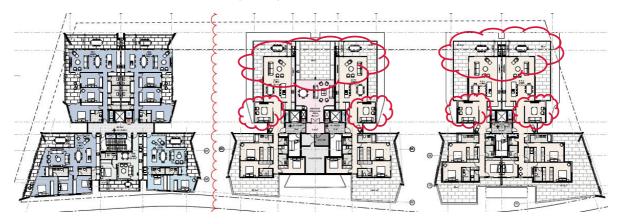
| Proposed Level 7 Plan showing larger apartments in the central and eastern buildings, by extending the glass line to the north and having the living rooms protrude from the facades on the east and west
